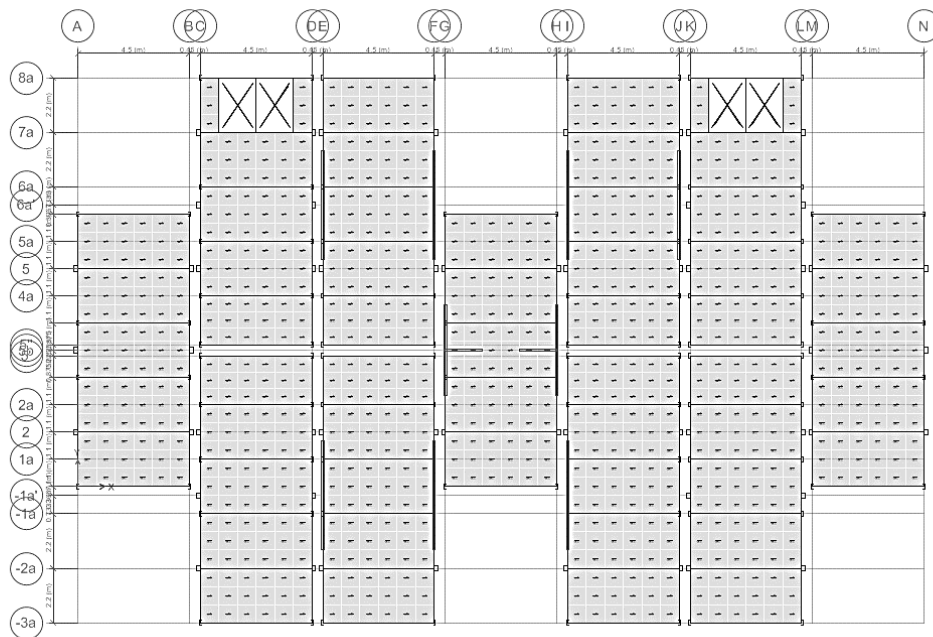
5 Plan View of a typical floor of the 3D finite element model above. (Note: The 100mm thick wall elements in modules are shown with the thicker grey lines).
